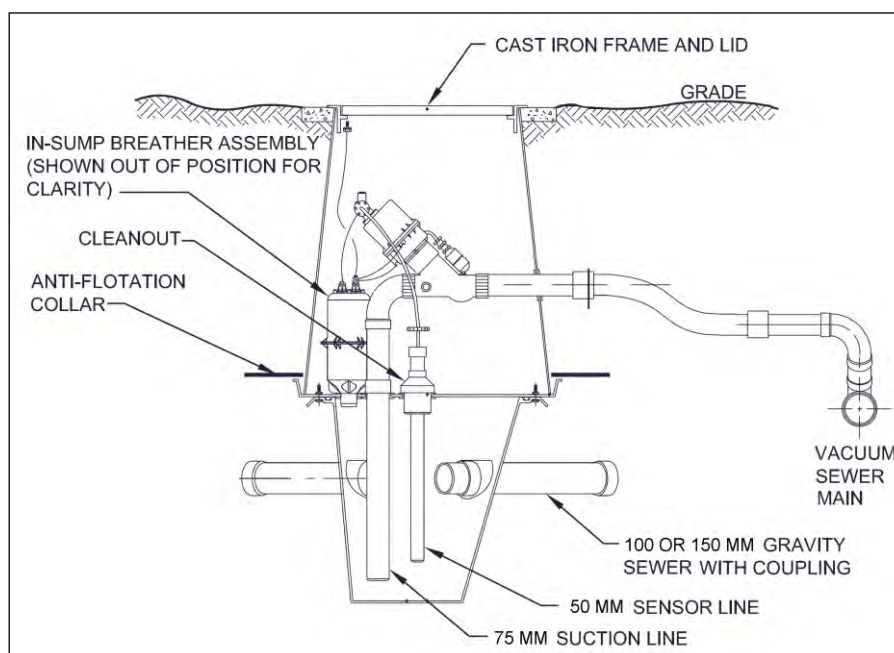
Valve pit and vacuum valve (WEF, 2008)
